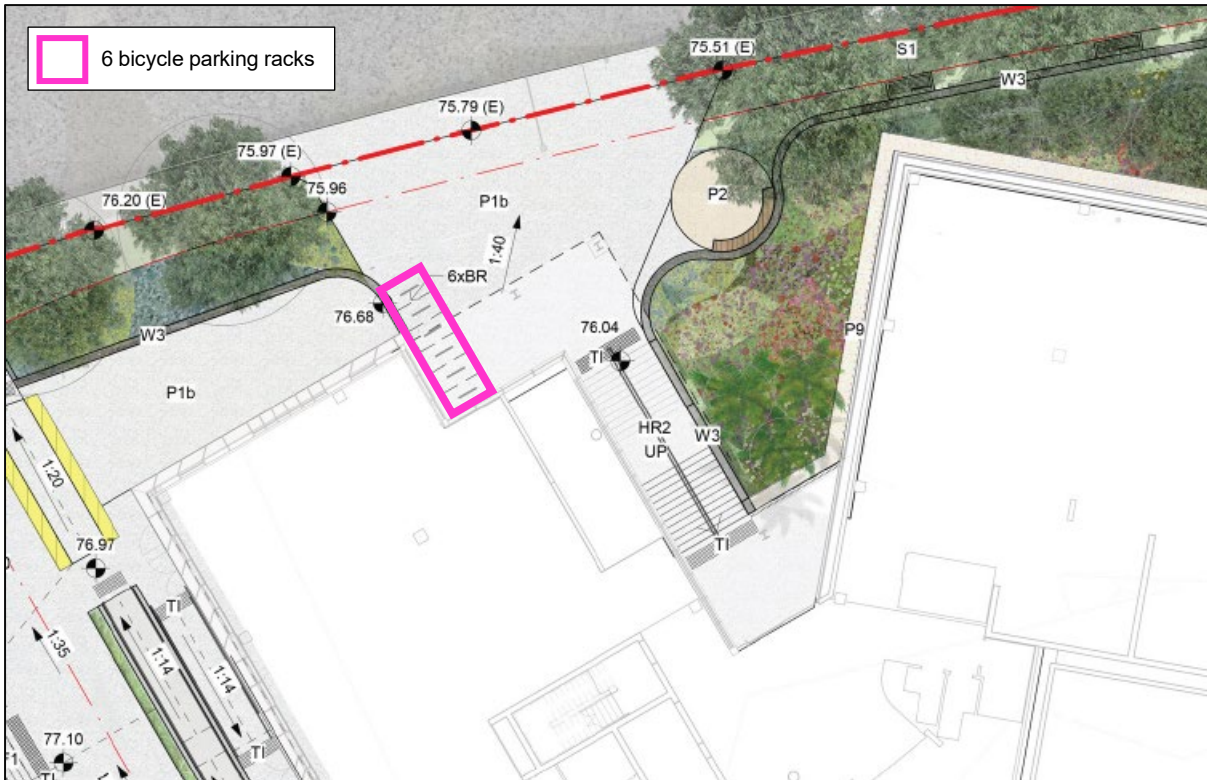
Revised landscaping plan illustrating six bicycle parking racks on Parkside Crescent. Source: Turf
